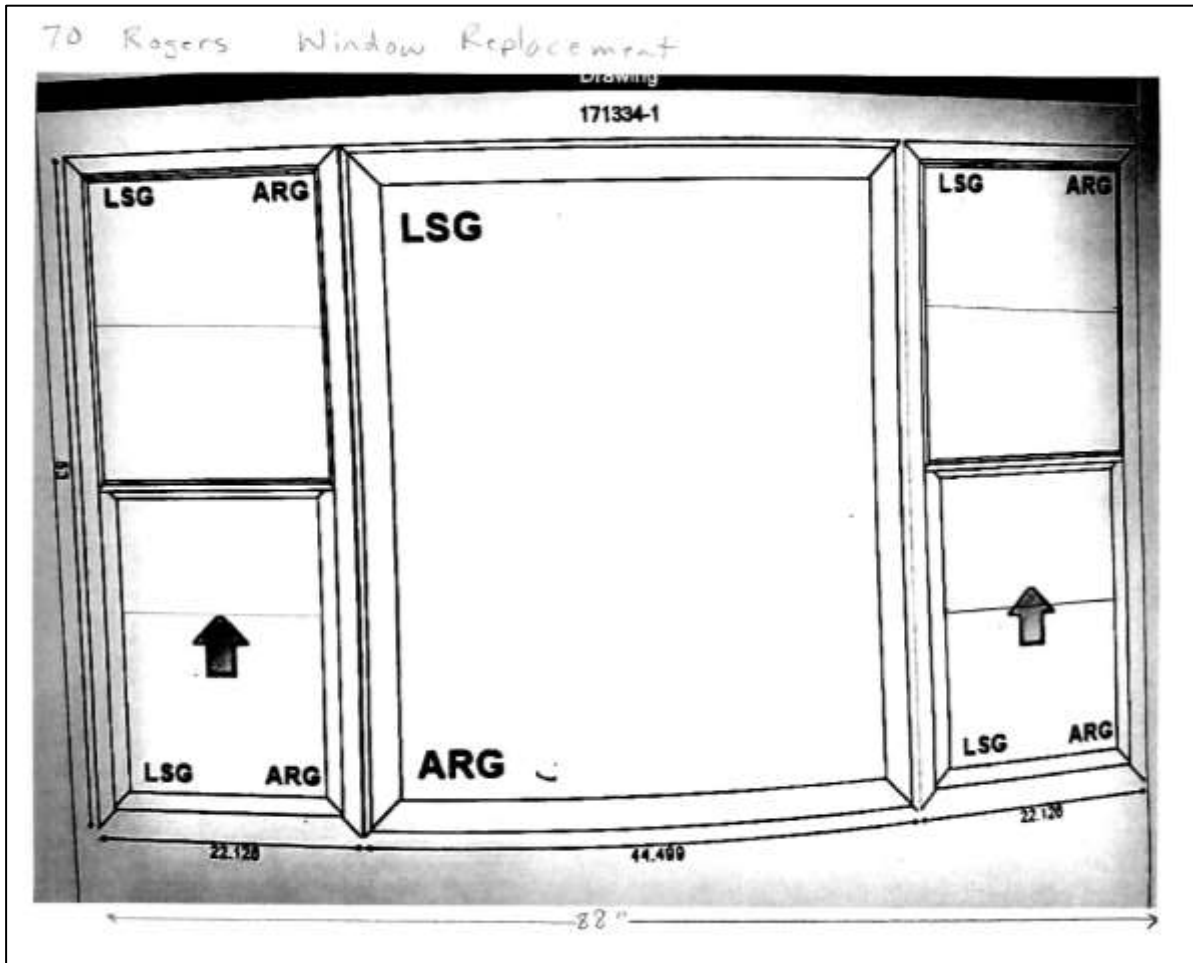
Sketch of proposed replacement window, submitted as part of the Heritage Alteration Permit application. The proposed window has a pair of sash (hung) windows, with applied mullions to replicate the detailing of the original window (annotated detail), which flank the centre fixed window.
